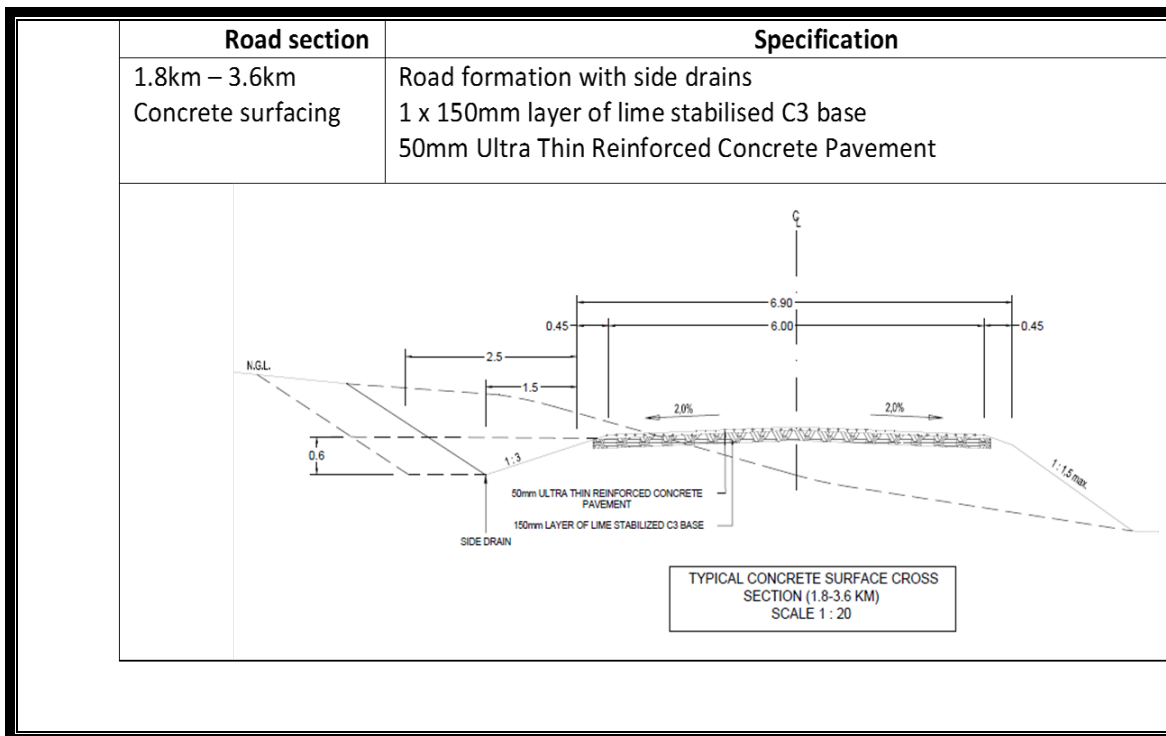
8. Road D1264 km 1.800 to km3.600 cross section (Nankhoo, 2011)
